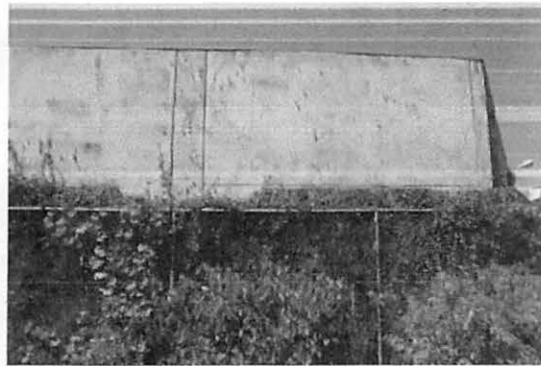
Clipped southeast corner façade with scored concrete cladding, facing northwest.
